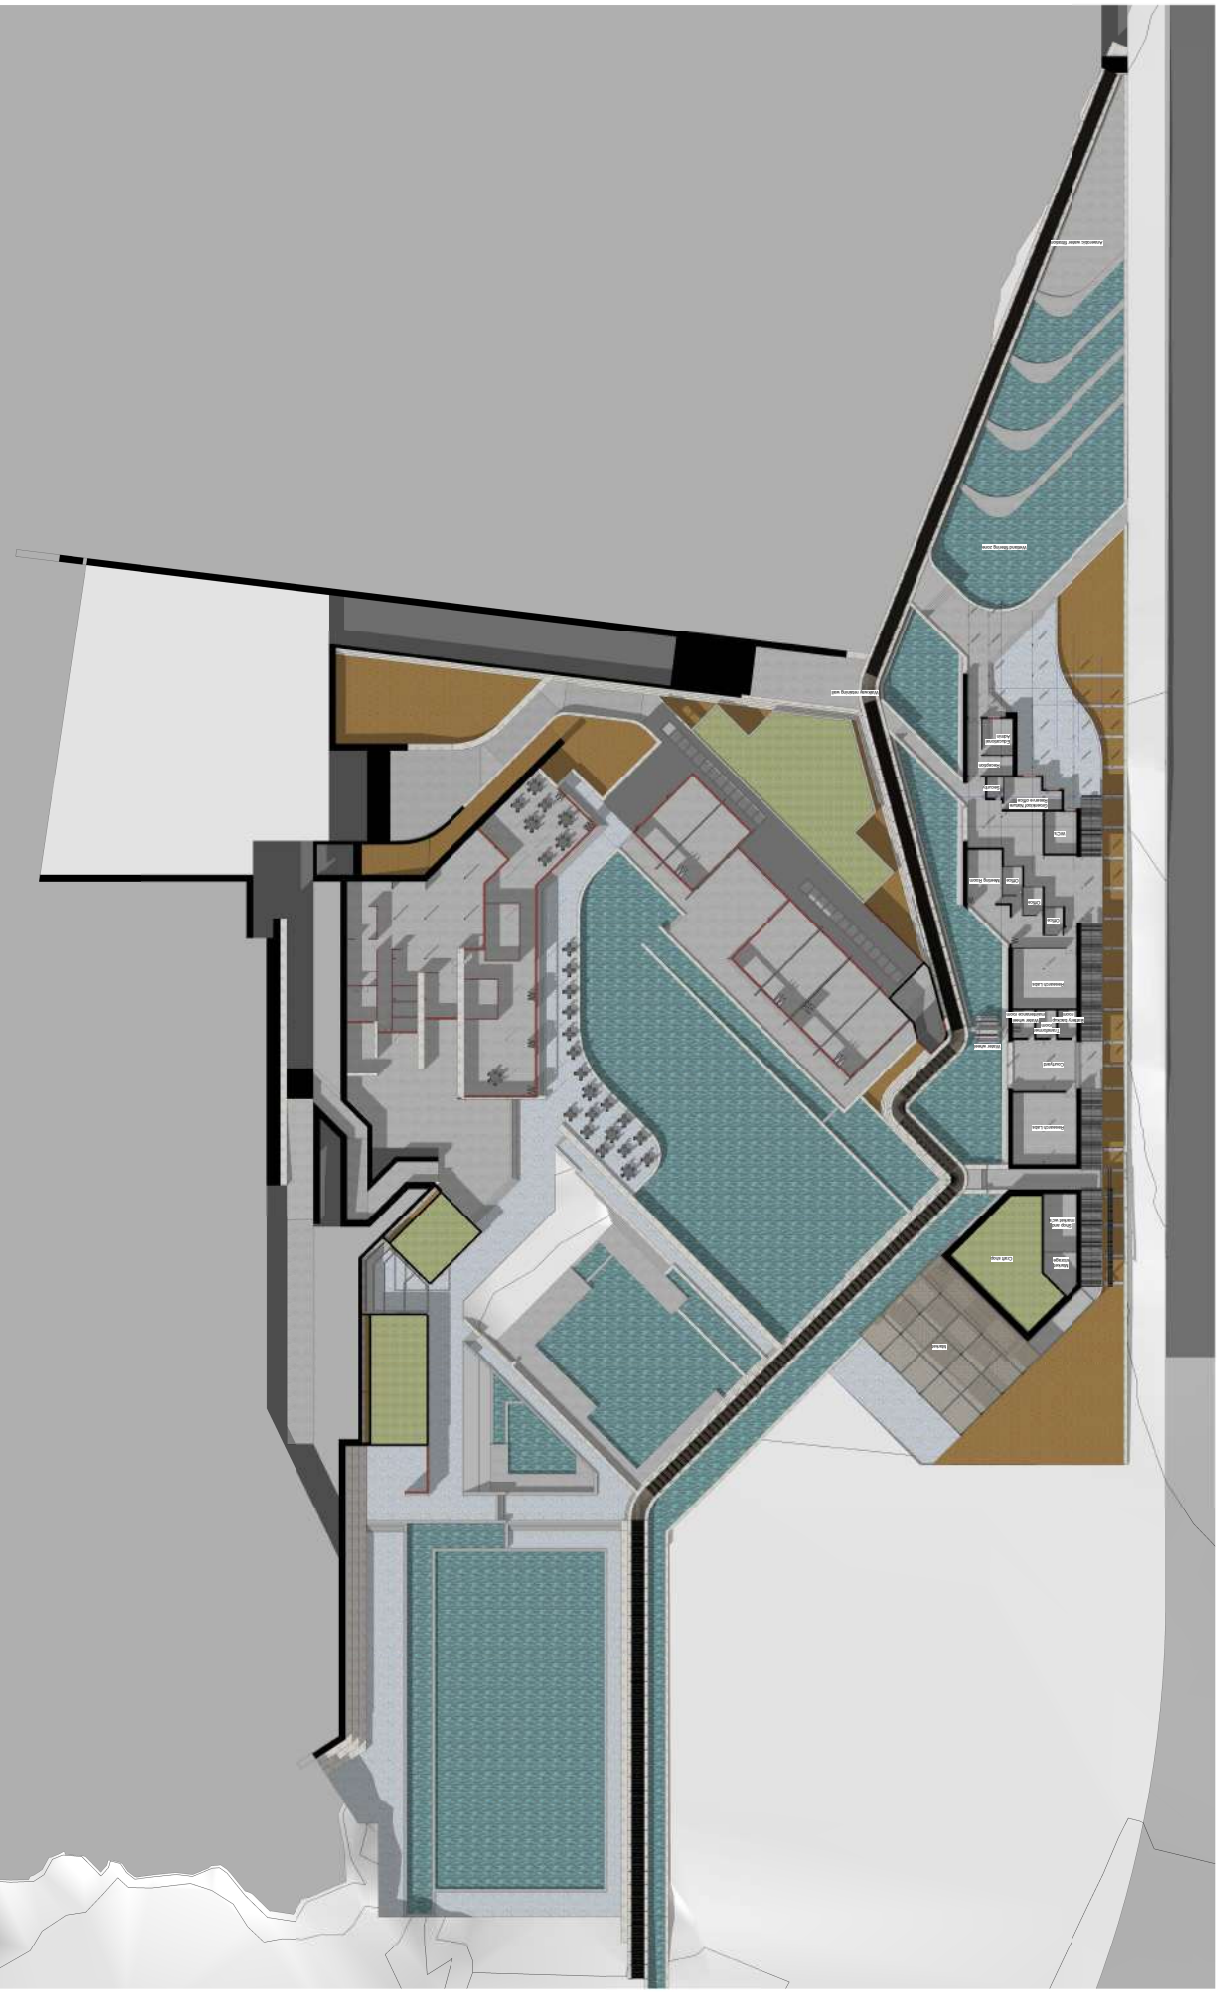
Design development Highway Ground Floor plan (Author, 2019)
